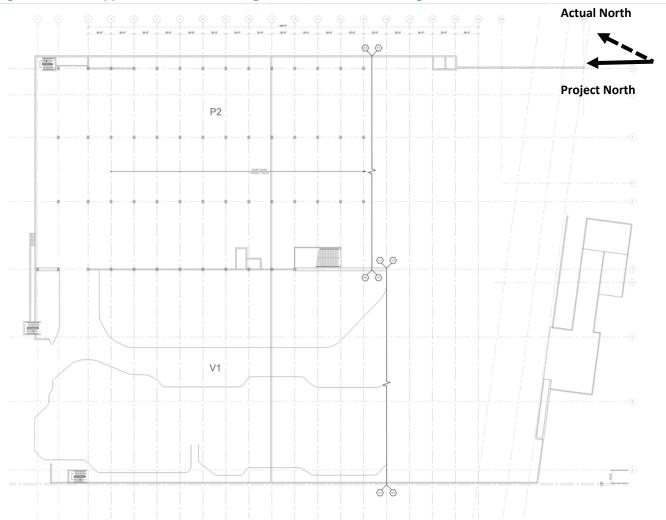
Upper Village and Partial Lower Village Levels, South Pier Parking Structure
